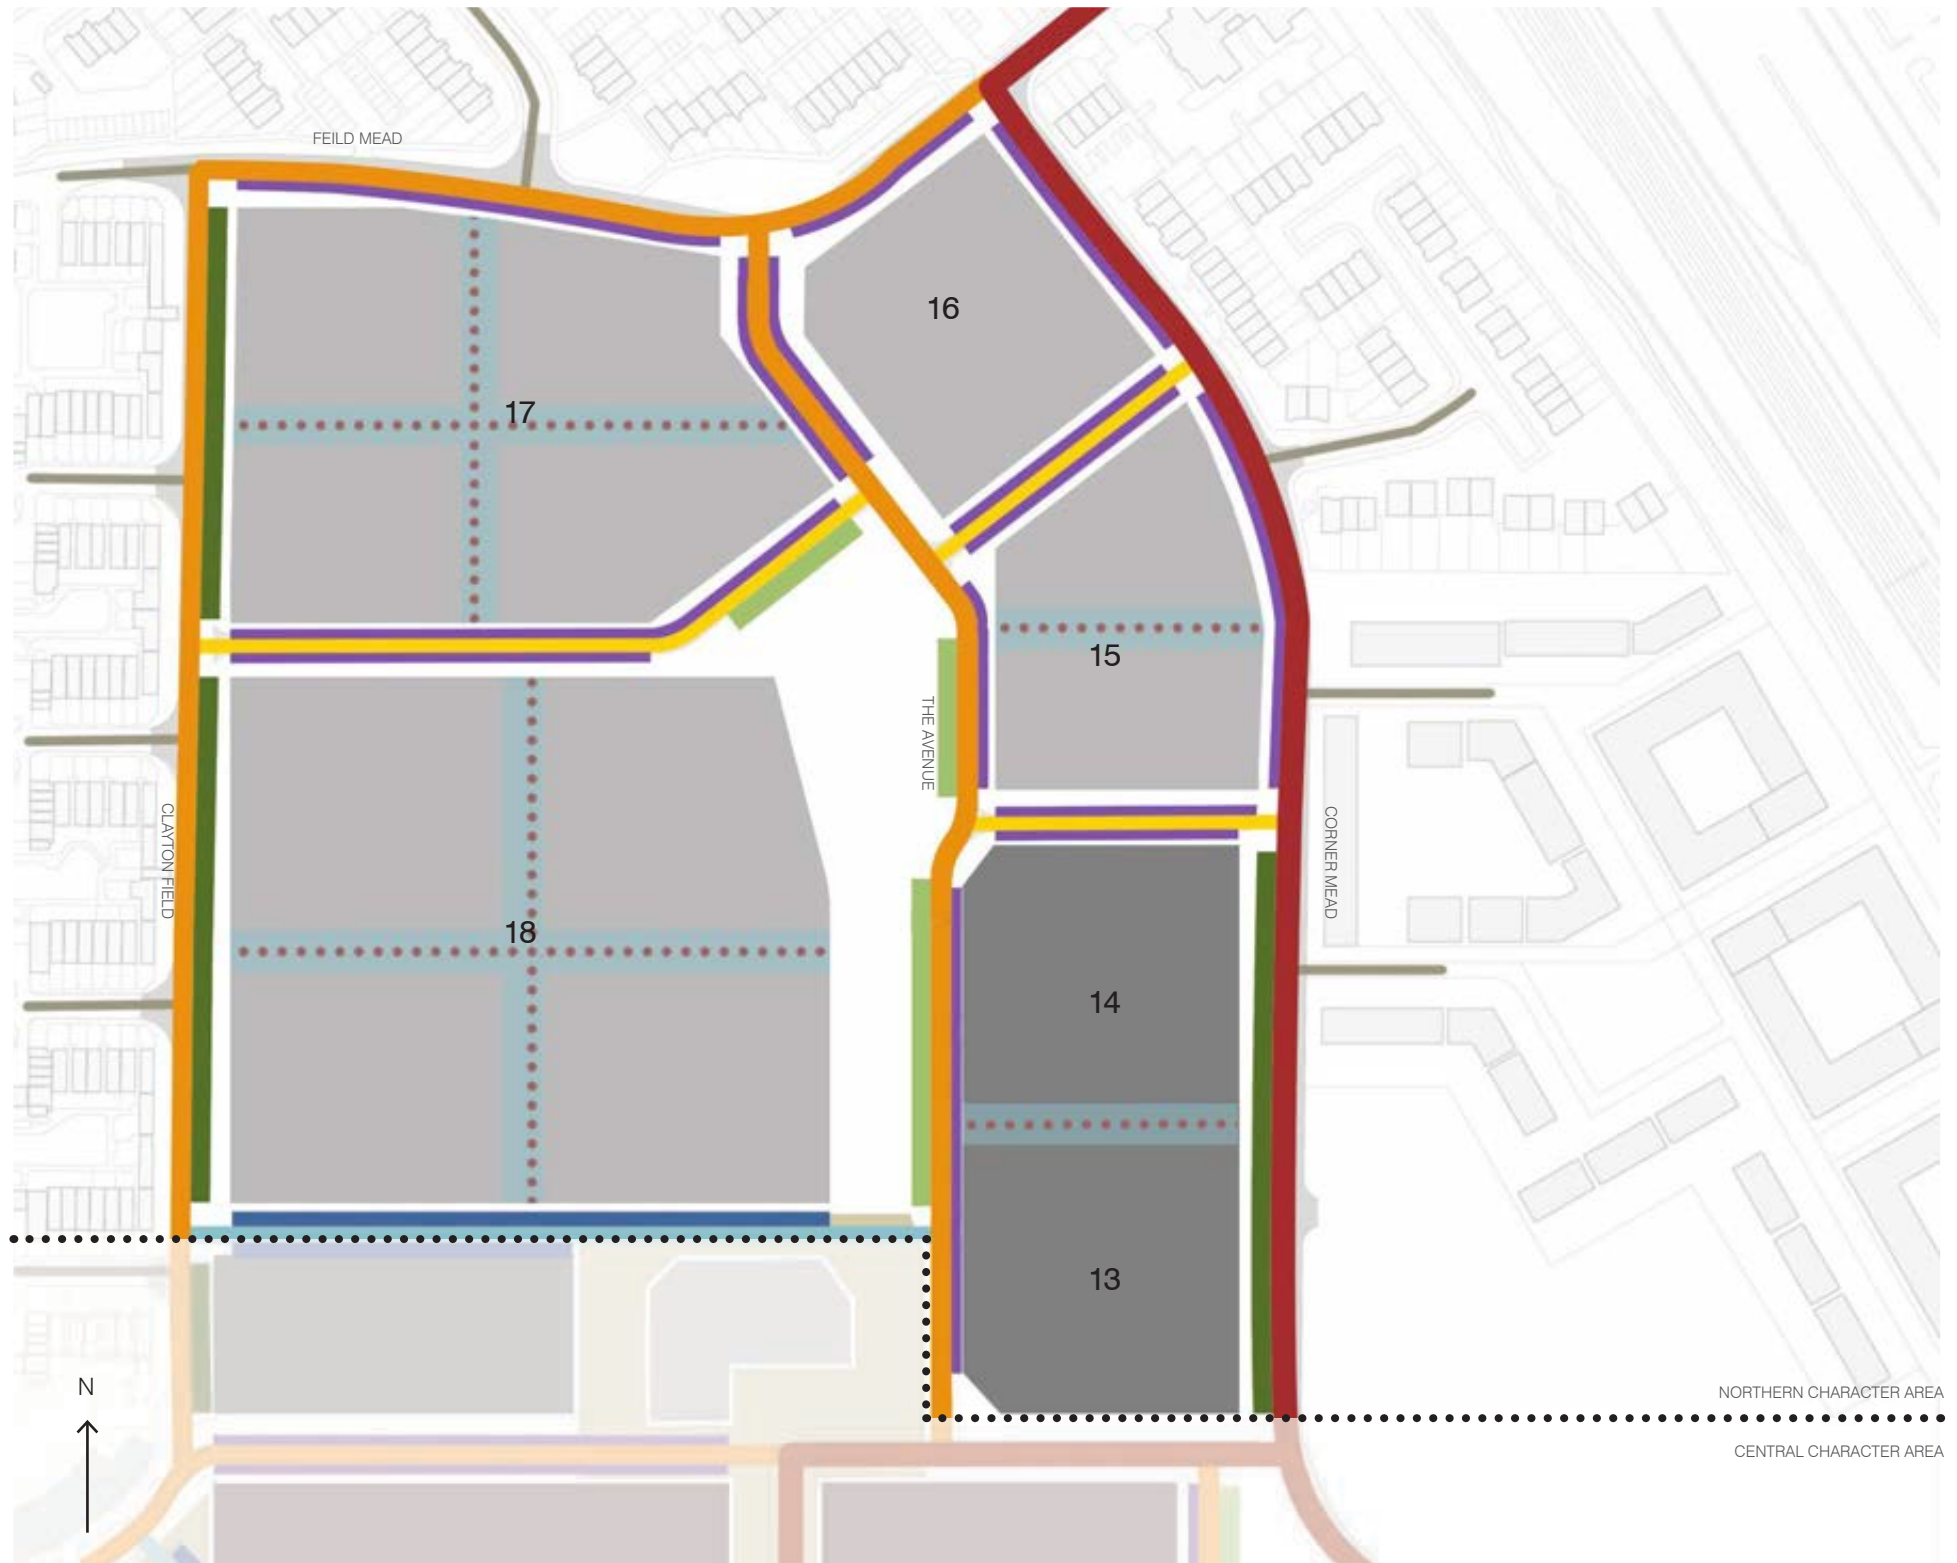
Combined Parameter Plan for Character Area Street and Parking Strategy
